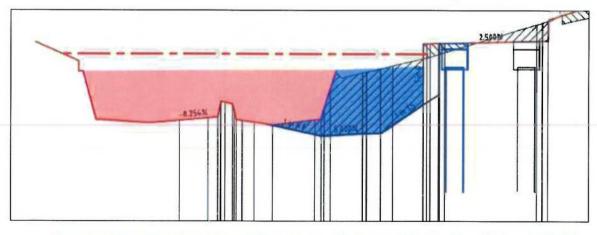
Sheas Creek Open Channel Cross Section Upstream of Huntley Street (taken at CH 220)
